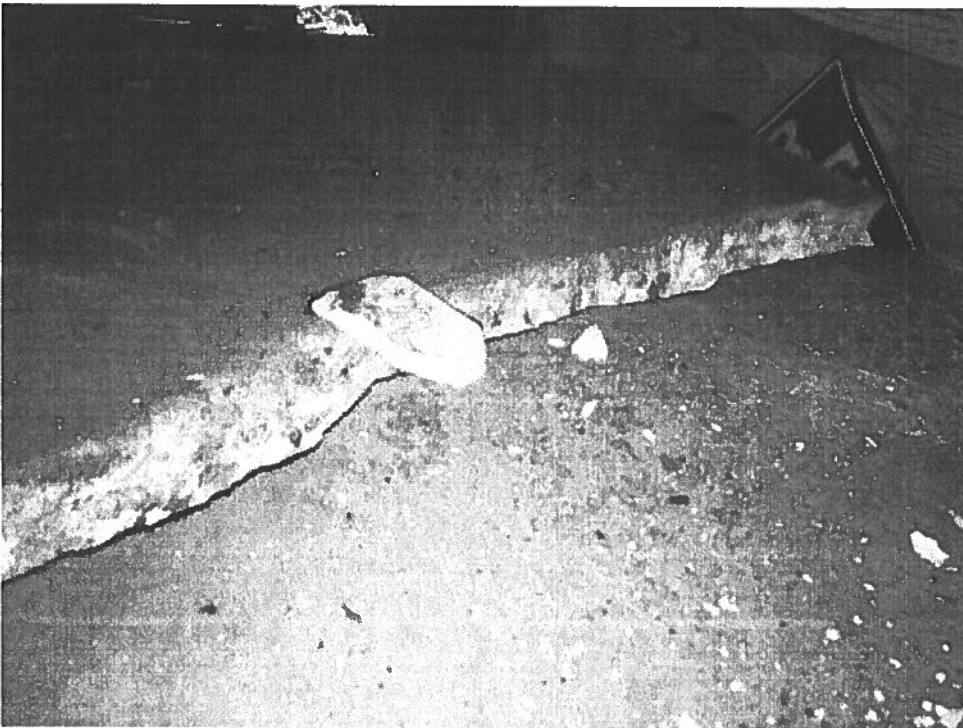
Concrete Slab Foundation Cracking and Movement
